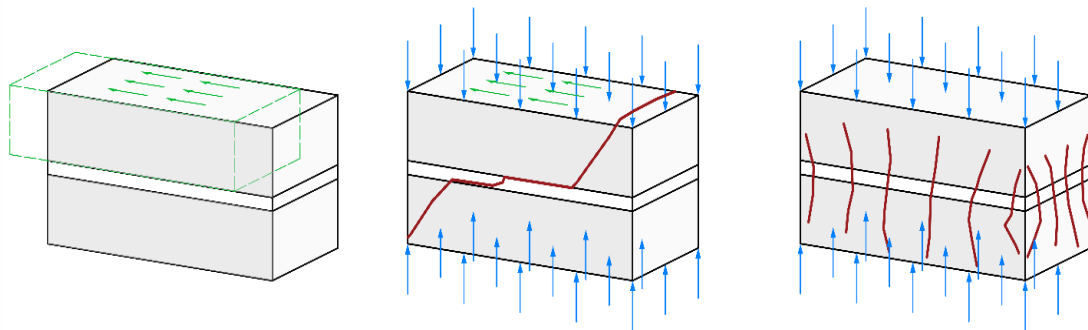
Typical failure modes of masonry at a two-block masonry assemblage scale: detachment, mixed mode (detachment and sliding) and crushing [49].
